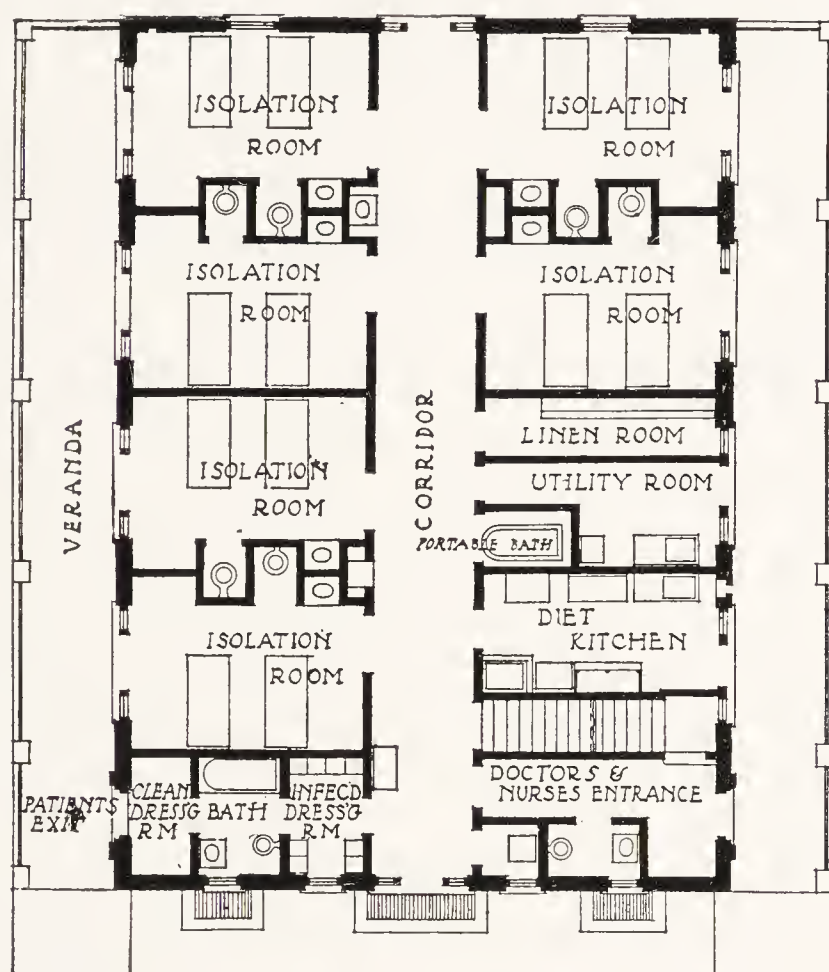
PLANS, ISOLATION BUILDING, KINGSTON GENERAL HOSPITAL, KINGSTON, ONTARIO
